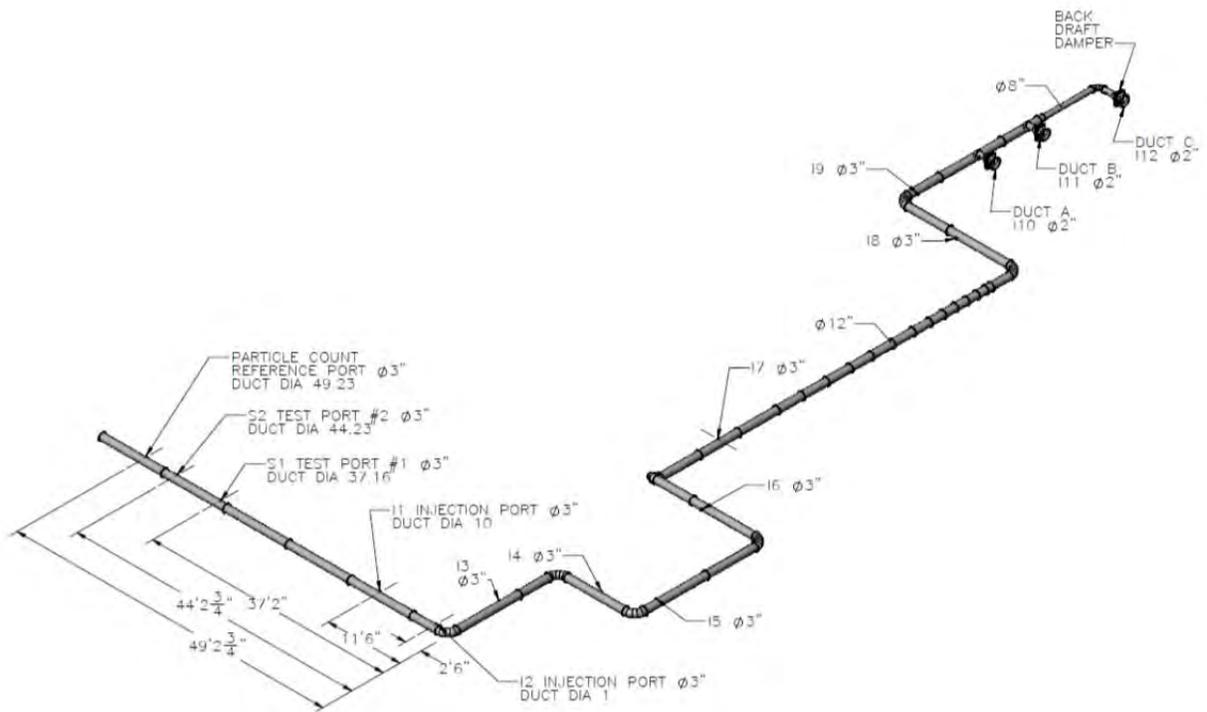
Layout of LAW LVP (LV-S3) Scale Model Test System
